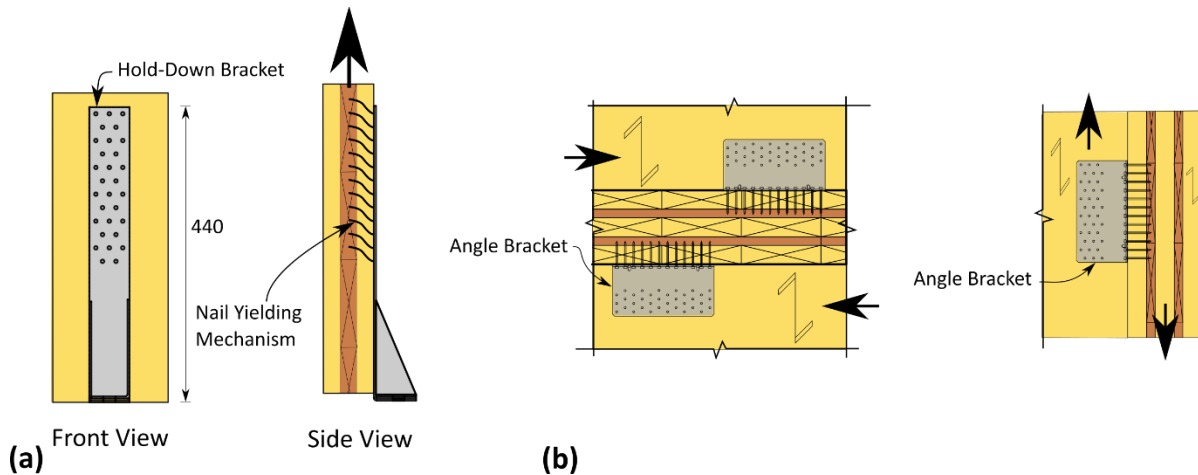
Commercial connectors with CLT walls (a) hold-downs, and (b) angle brackets
